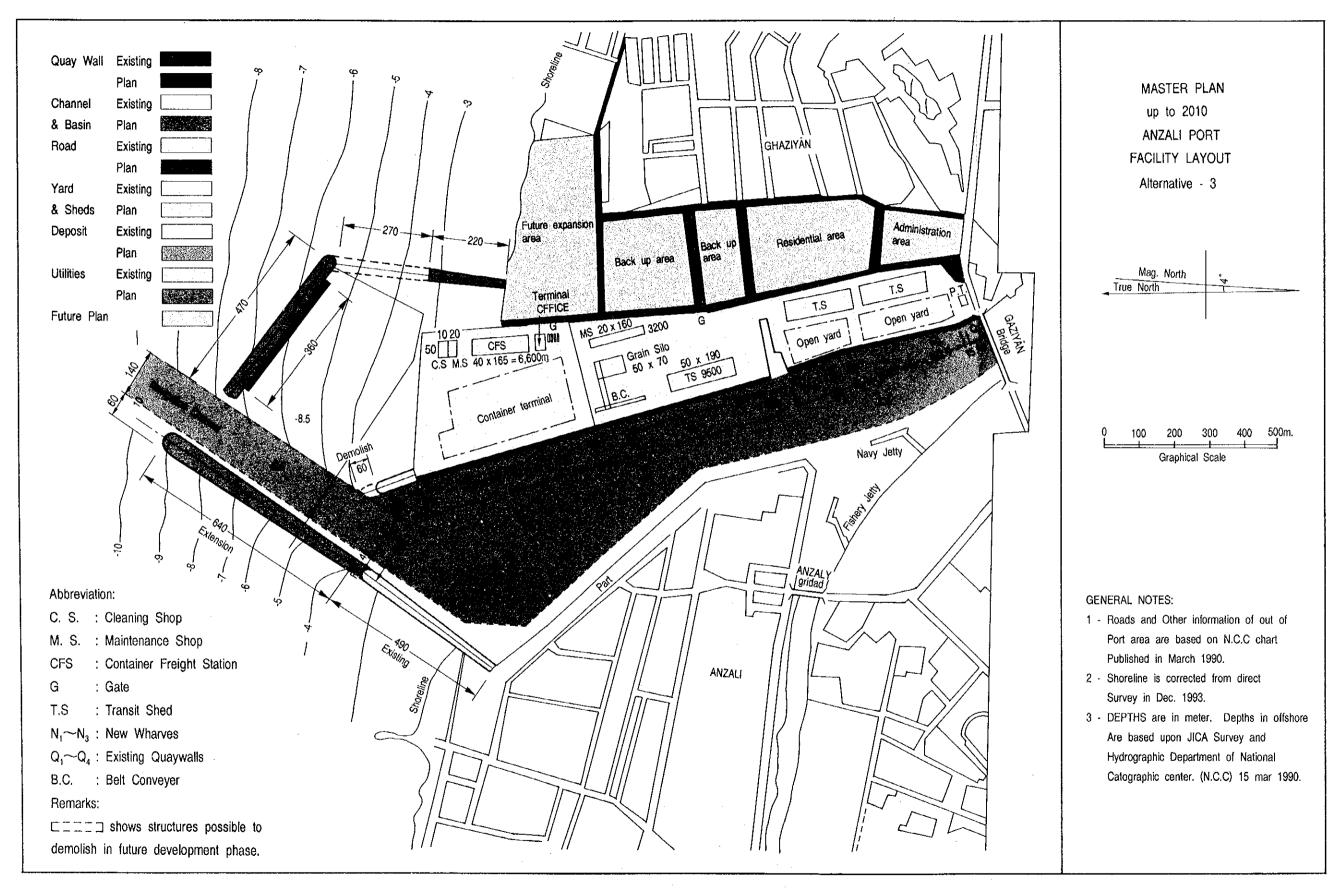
Alternative Plan 3 (Master Plan)
